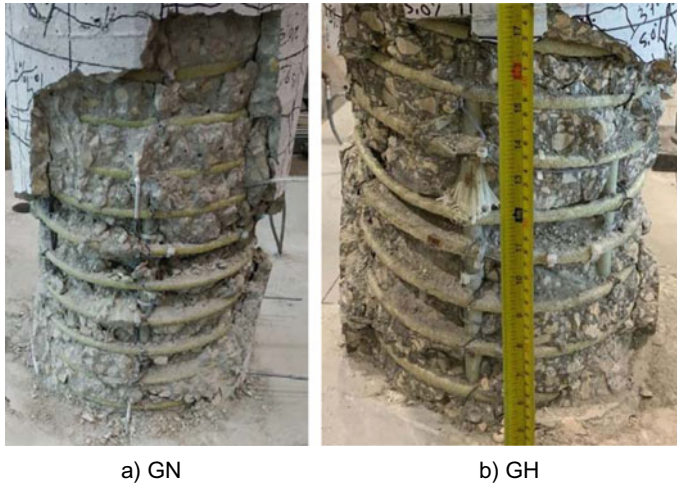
Mode of failure. a Specimen GN. b Specimen GH
